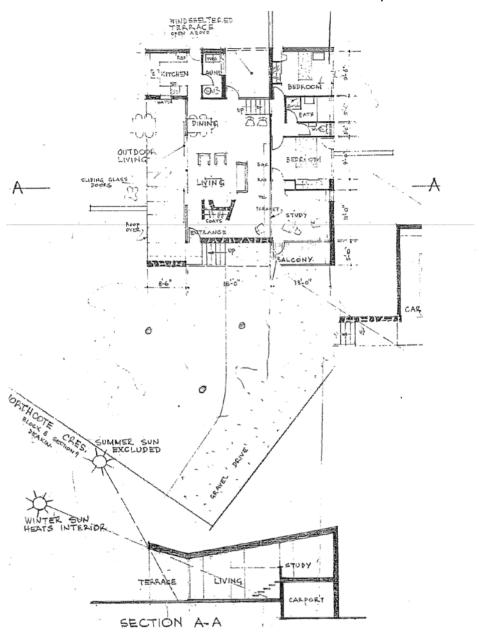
Original Plan and Section of 11 Northcote Crescent, Deakin. ACT Land and Planning Authority (ACTPLA), Customer Services, Mitchell. Building File for Block 8 Section 9 Deakin.
